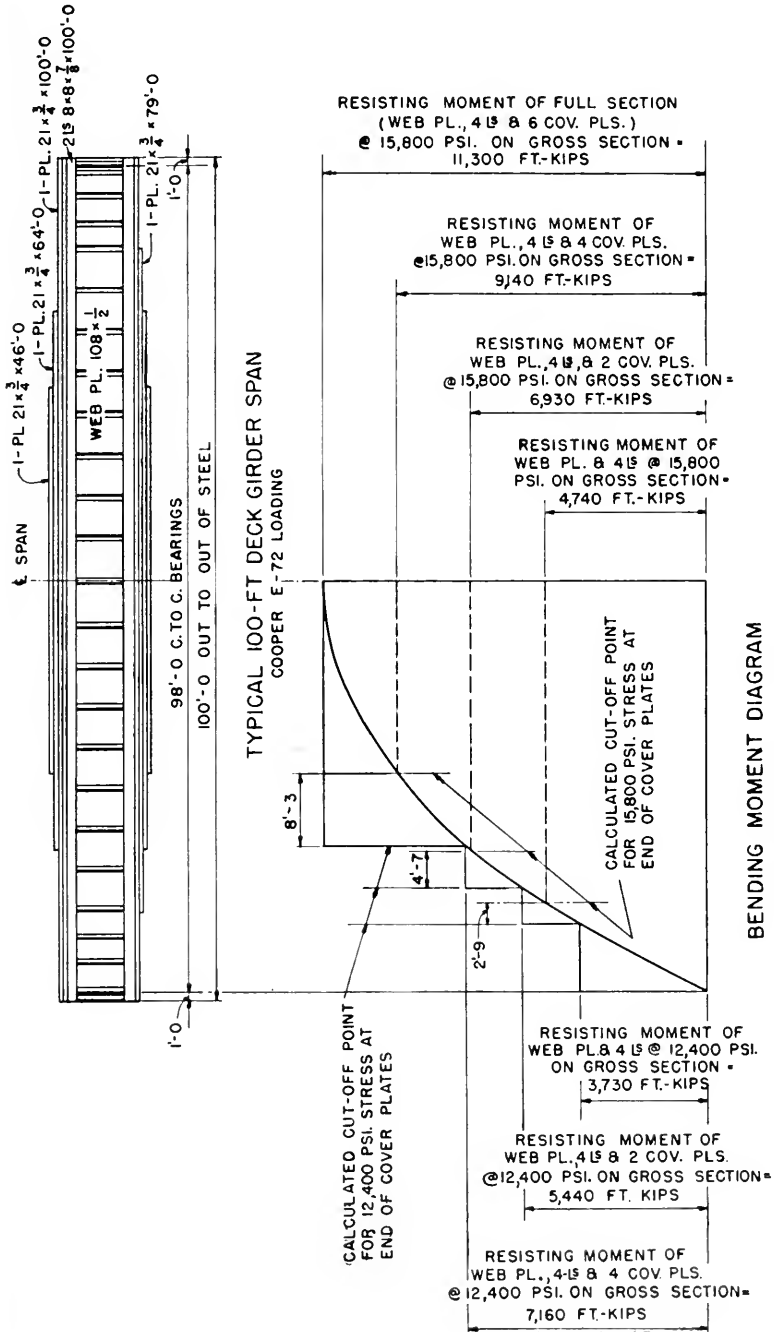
Determination of cover plate lengths. 100-ft. riveted deck girder span. Ballasted timber floor.
